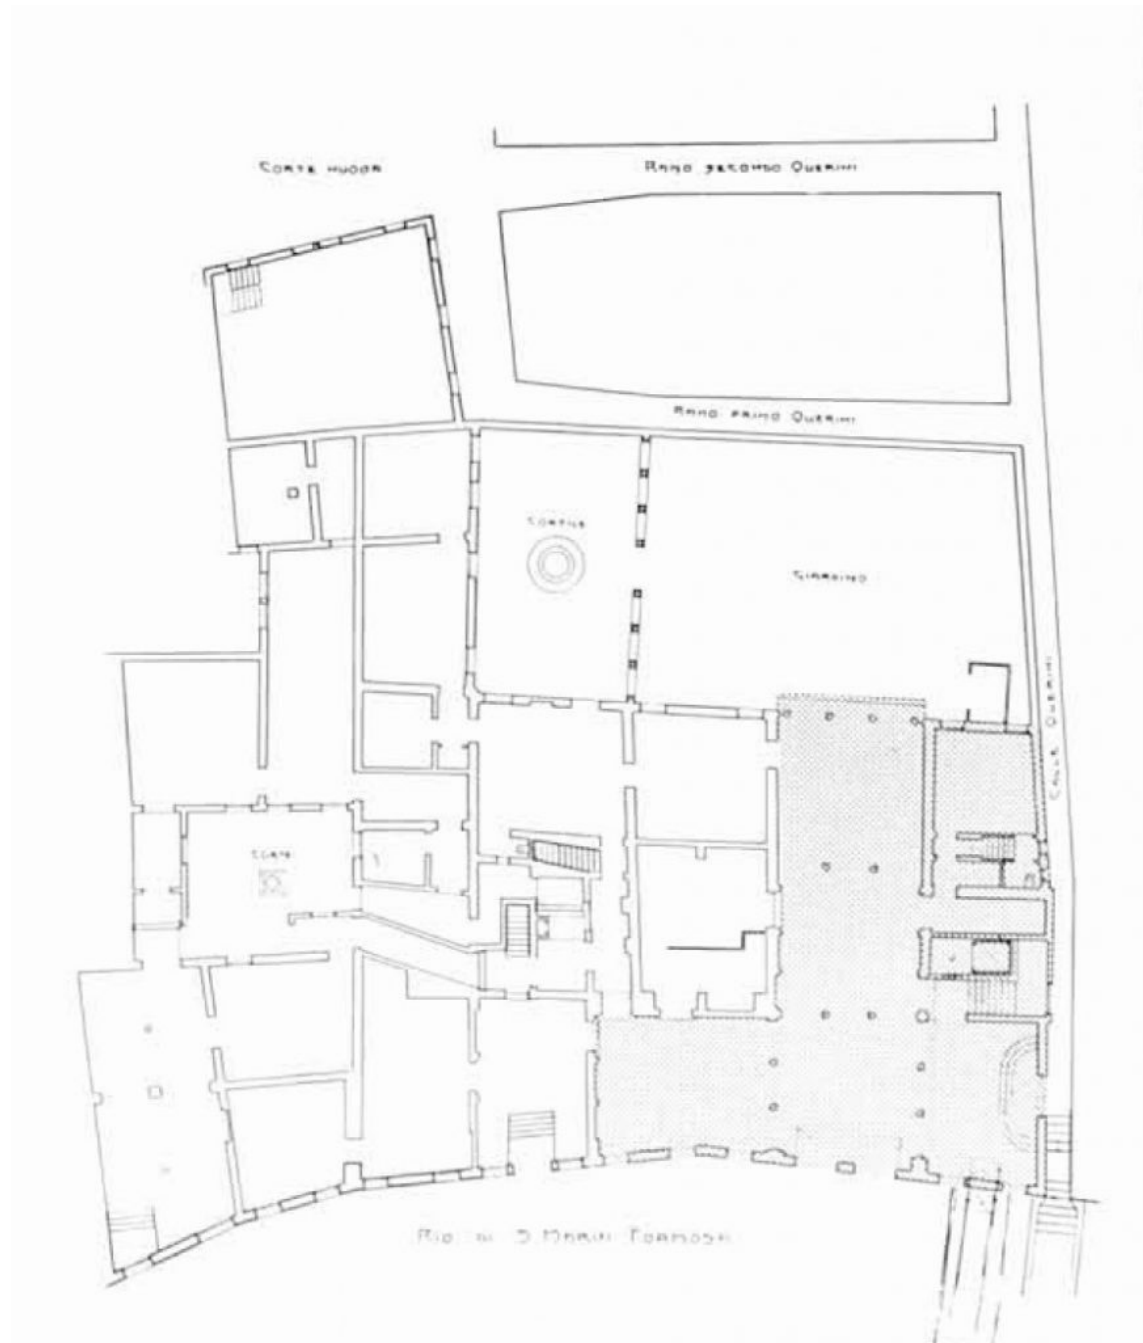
The ground floor plan prior to renovation, Querini Stampalia, Venice, Italy, 1963.⁸
